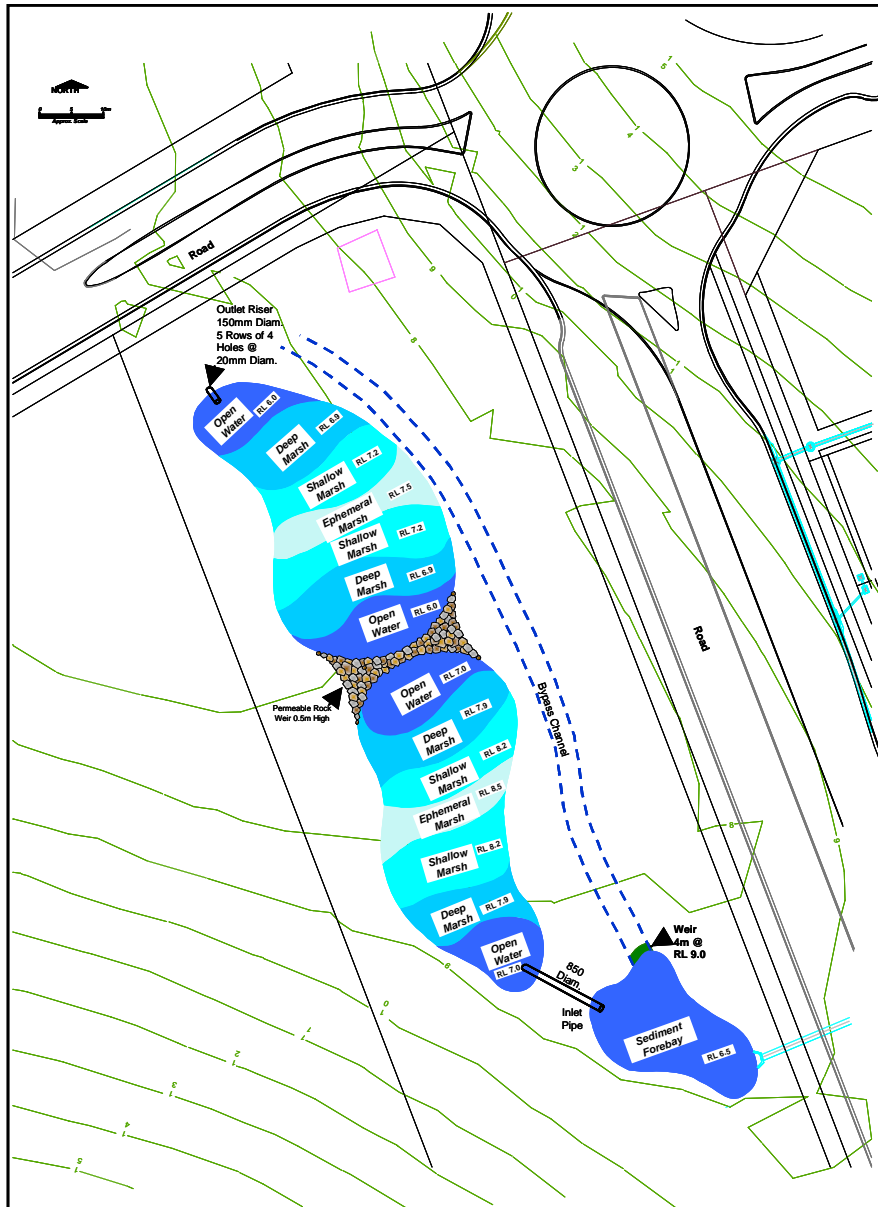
M: Example Layout of WSUD (Wetland) Concept Design
